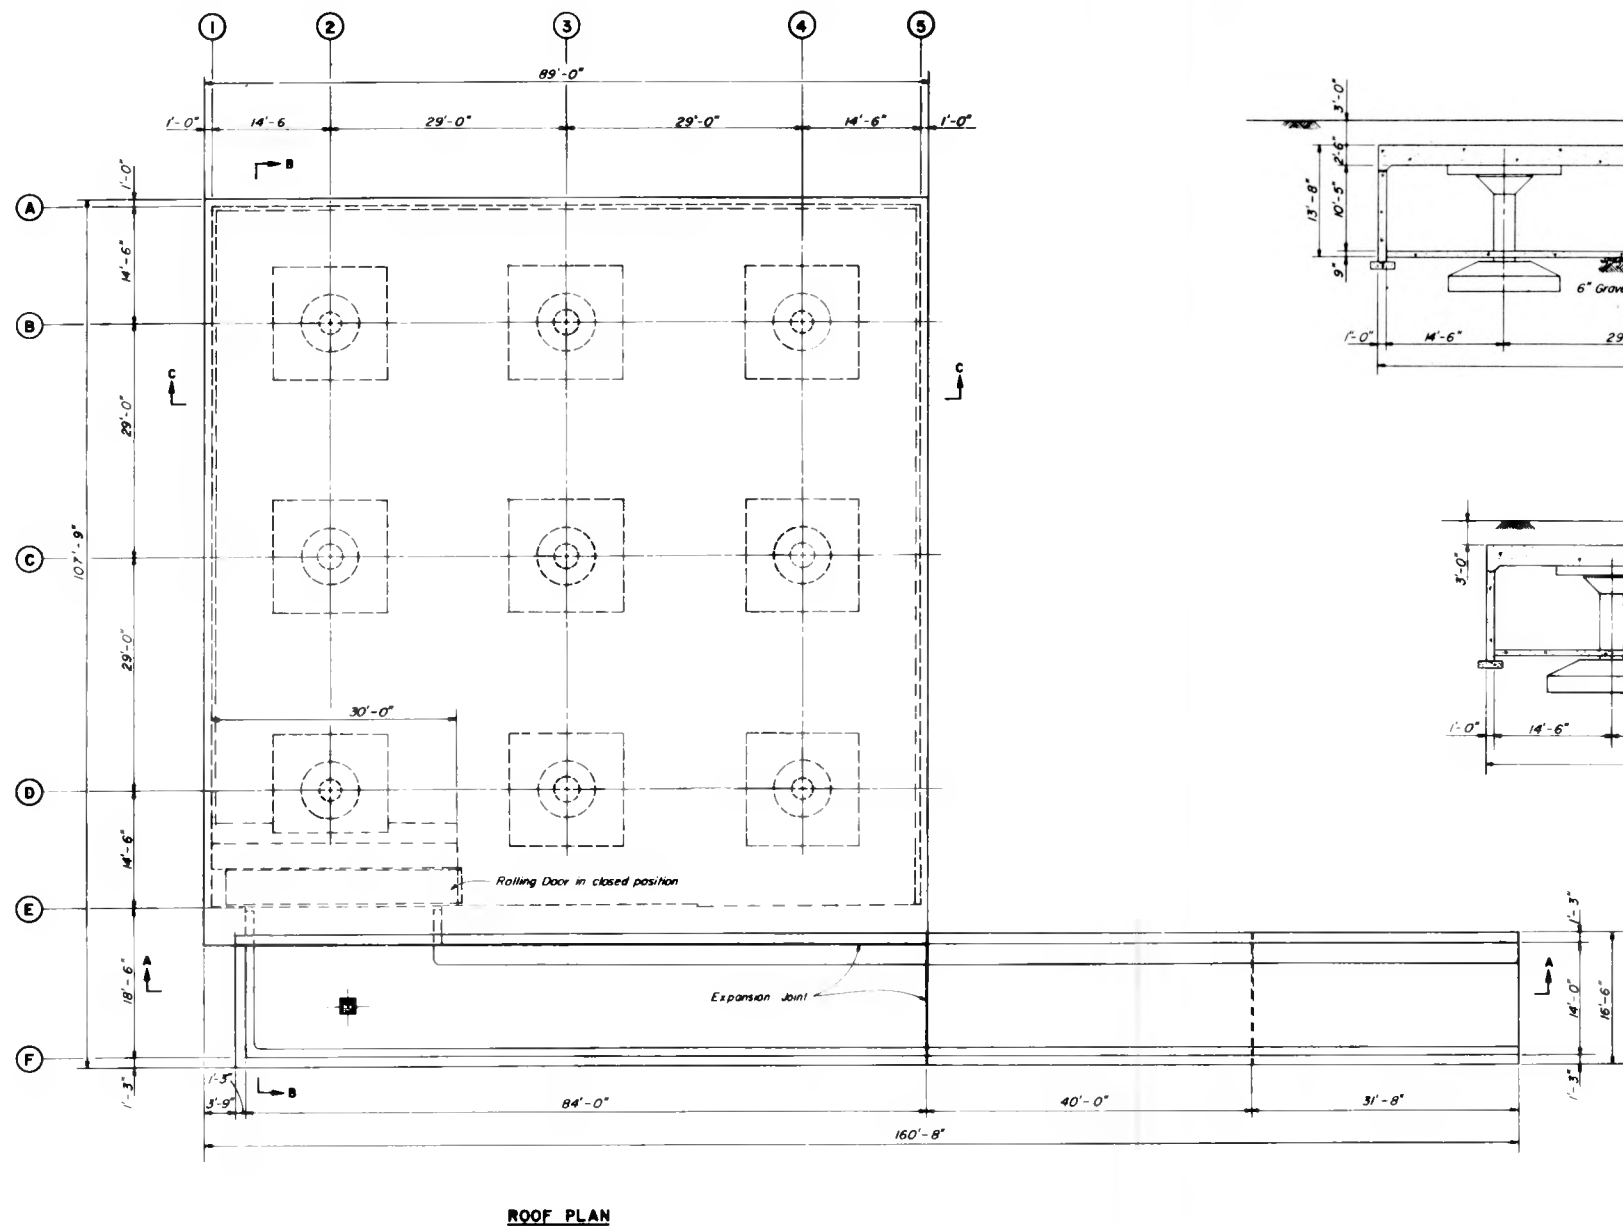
Preliminary layout of prototype flat-slab structure.
